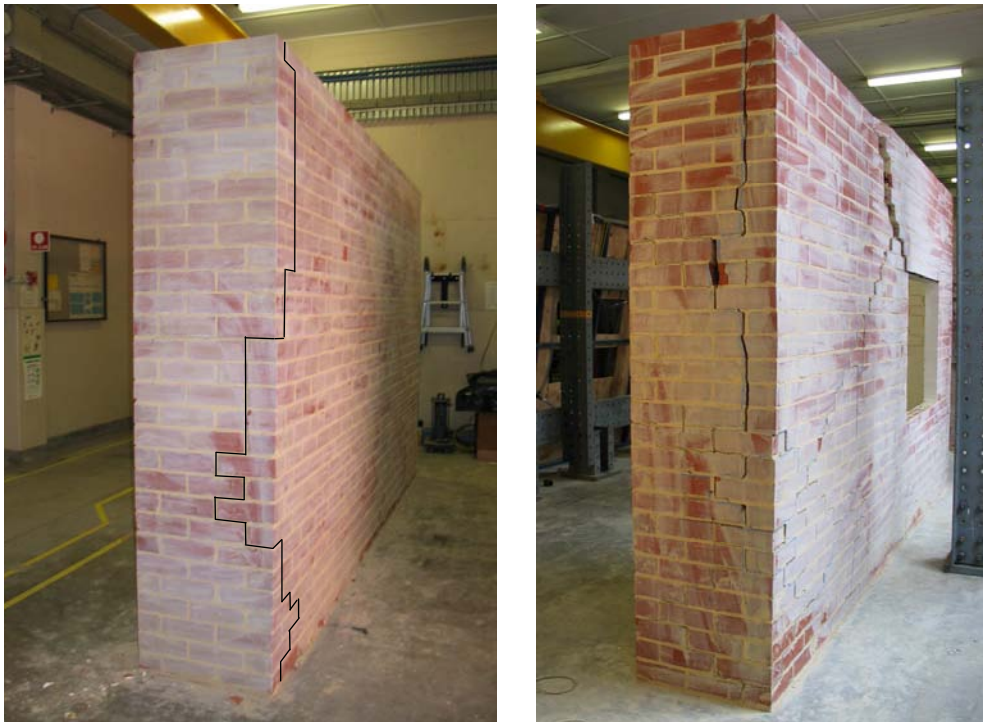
Examples of combined stepped and line failure along vertical edge cracks. Walls s2 and s6 shown.
